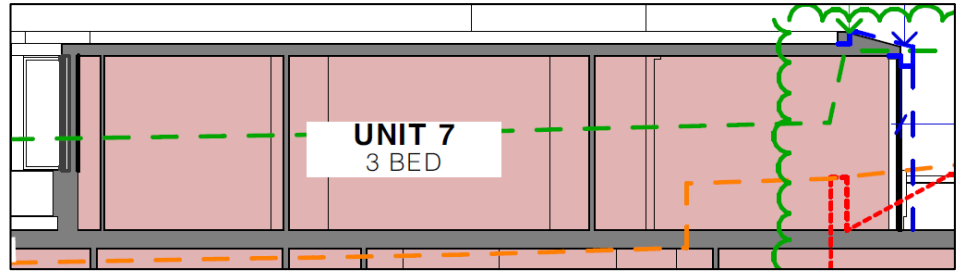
Existing Ground Level of the subject site (red line). (Source: AN+A, 2023)
